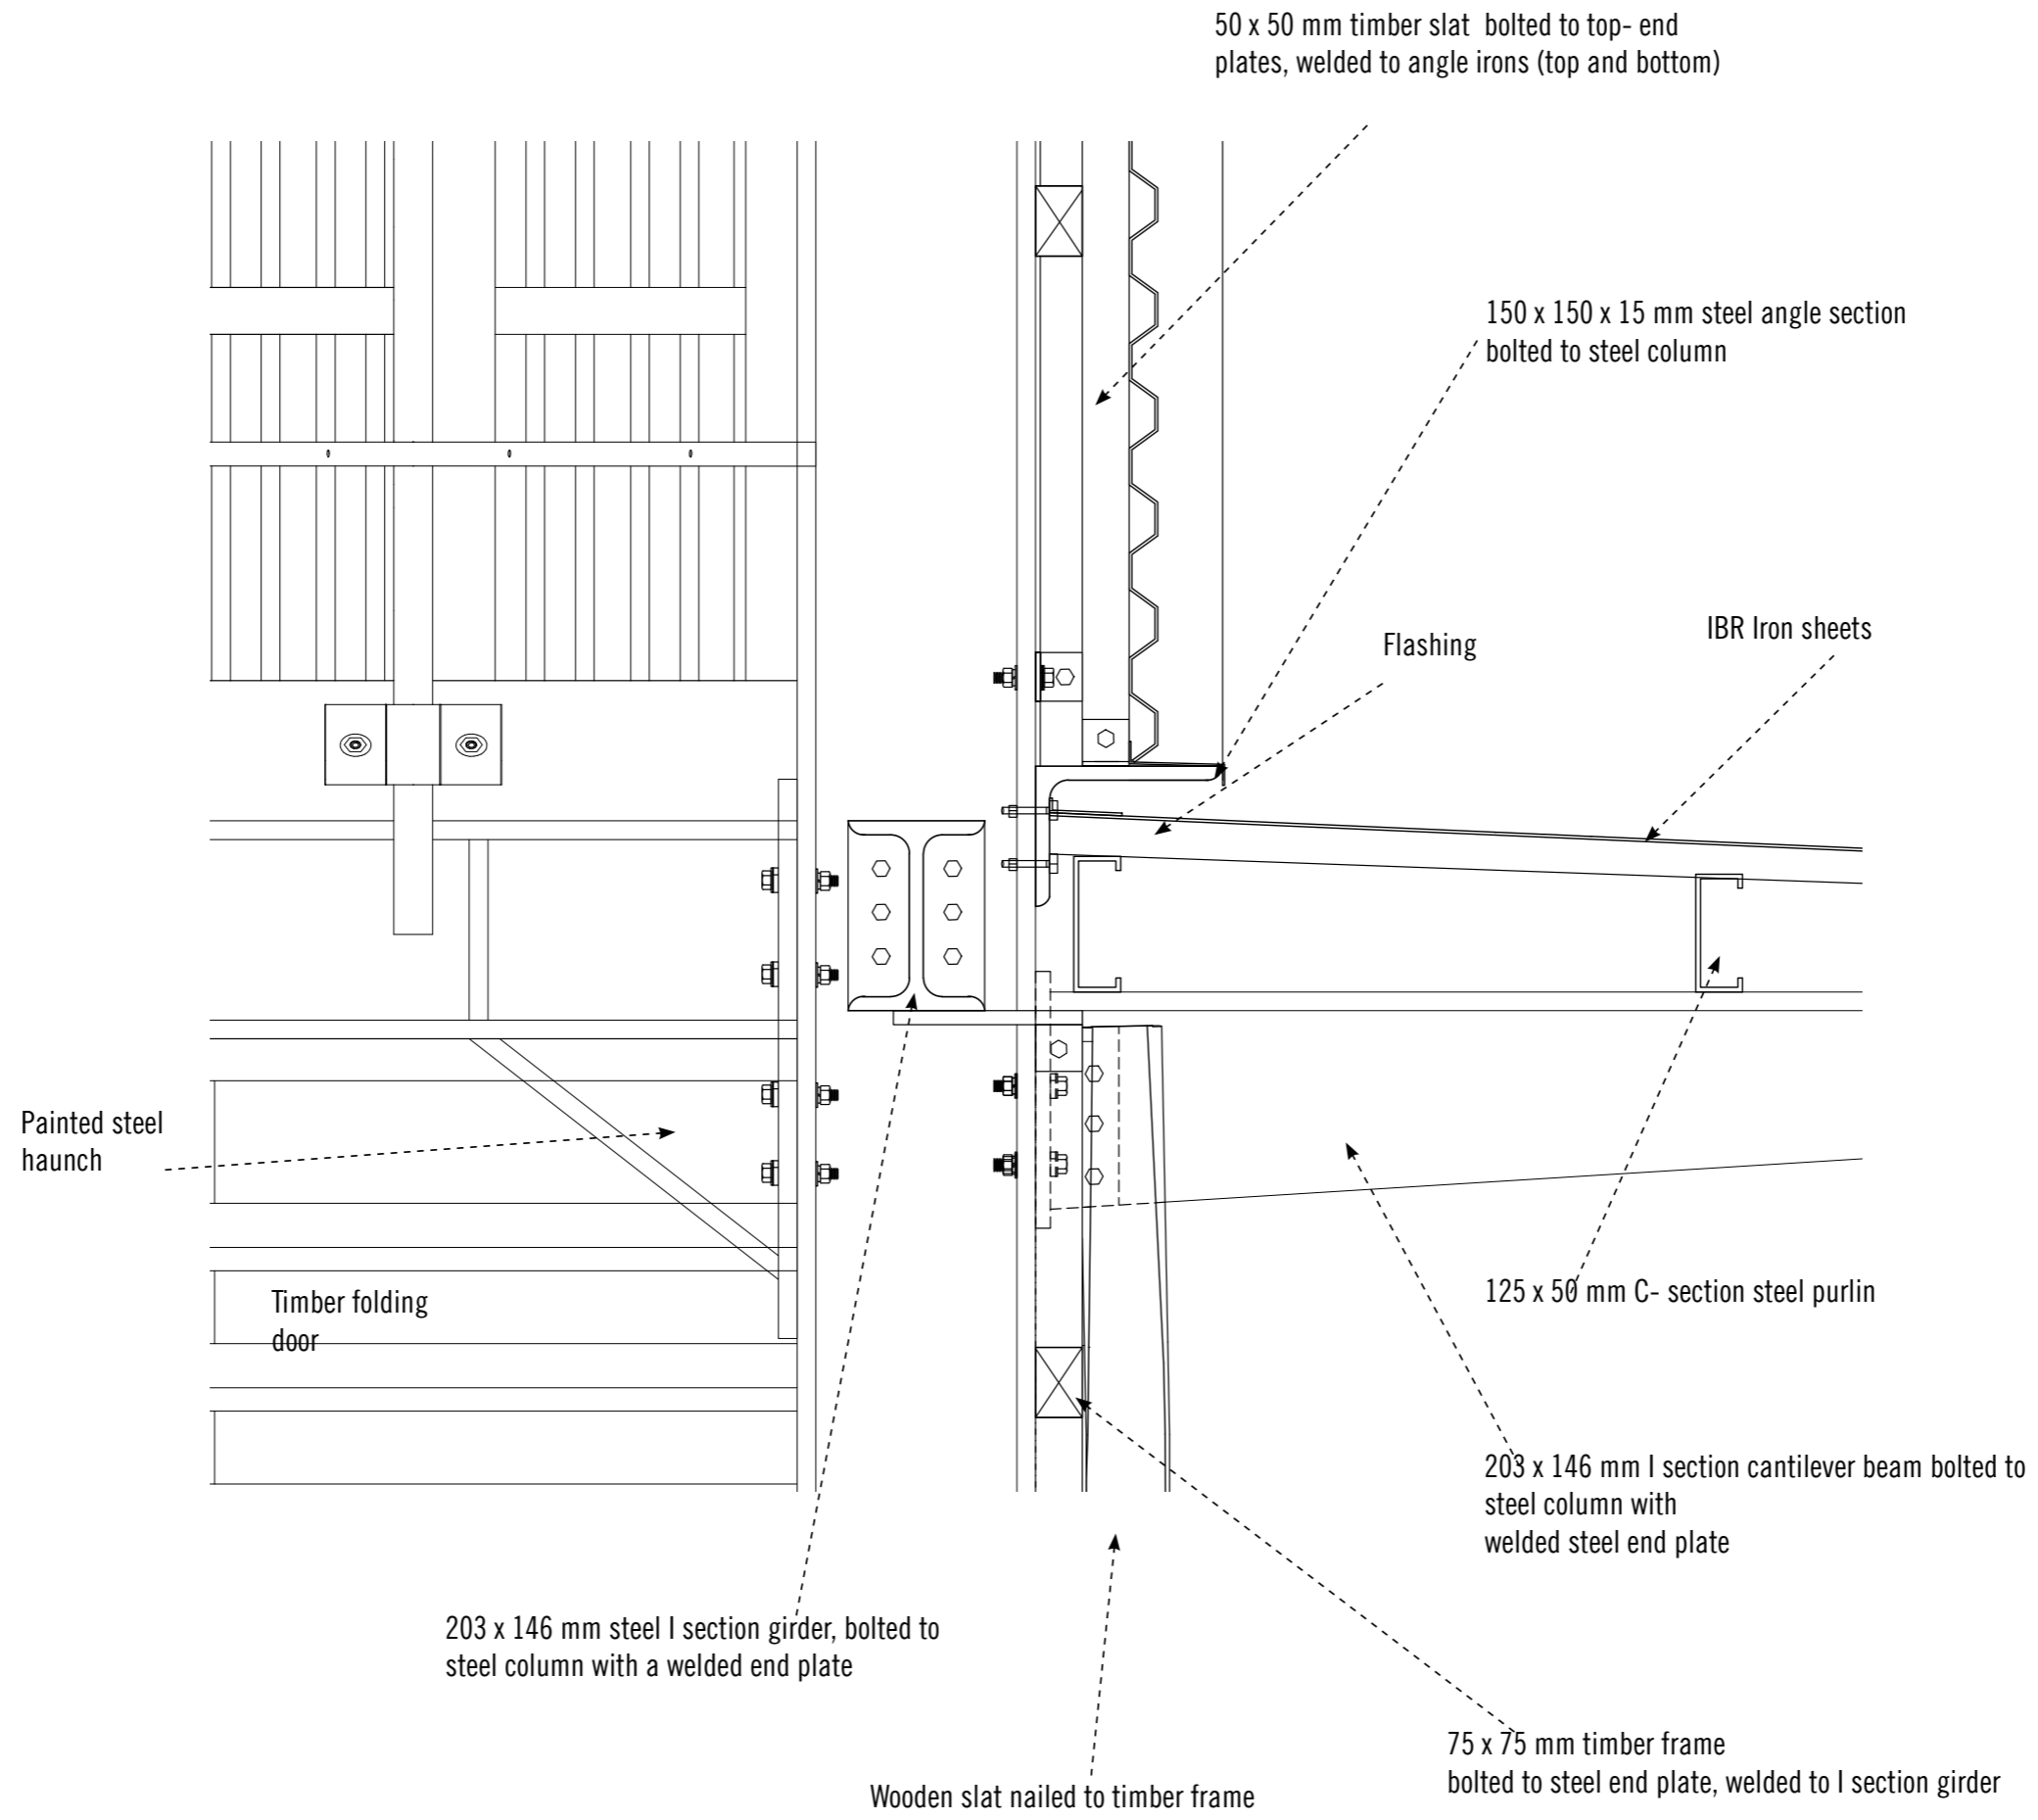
Cantilever canopy detail. Scale: 1:5 on A1
